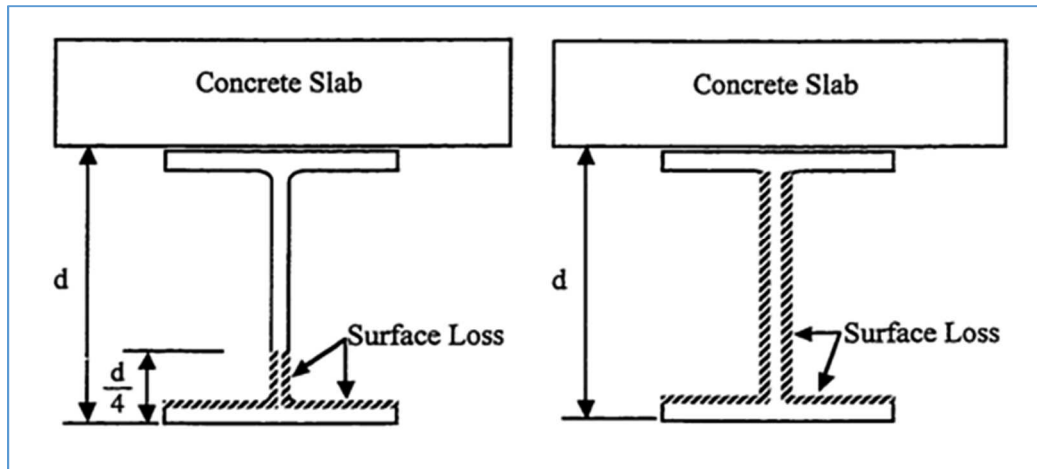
Corrosion on typical steel girder sections, at midspan (left), and at supports (right) (Park, 1999)
